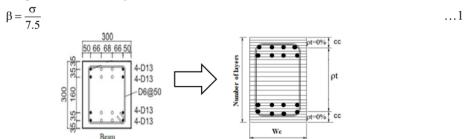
Detail of transverse reinforcement ratio of interior beam-column joint
